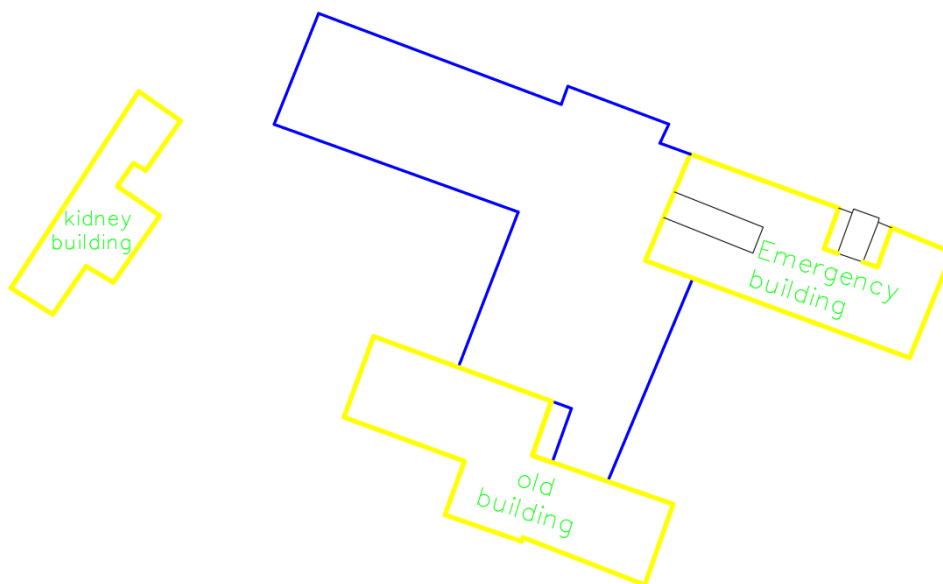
Distribution of the roofs on which the PV system will be installed.
